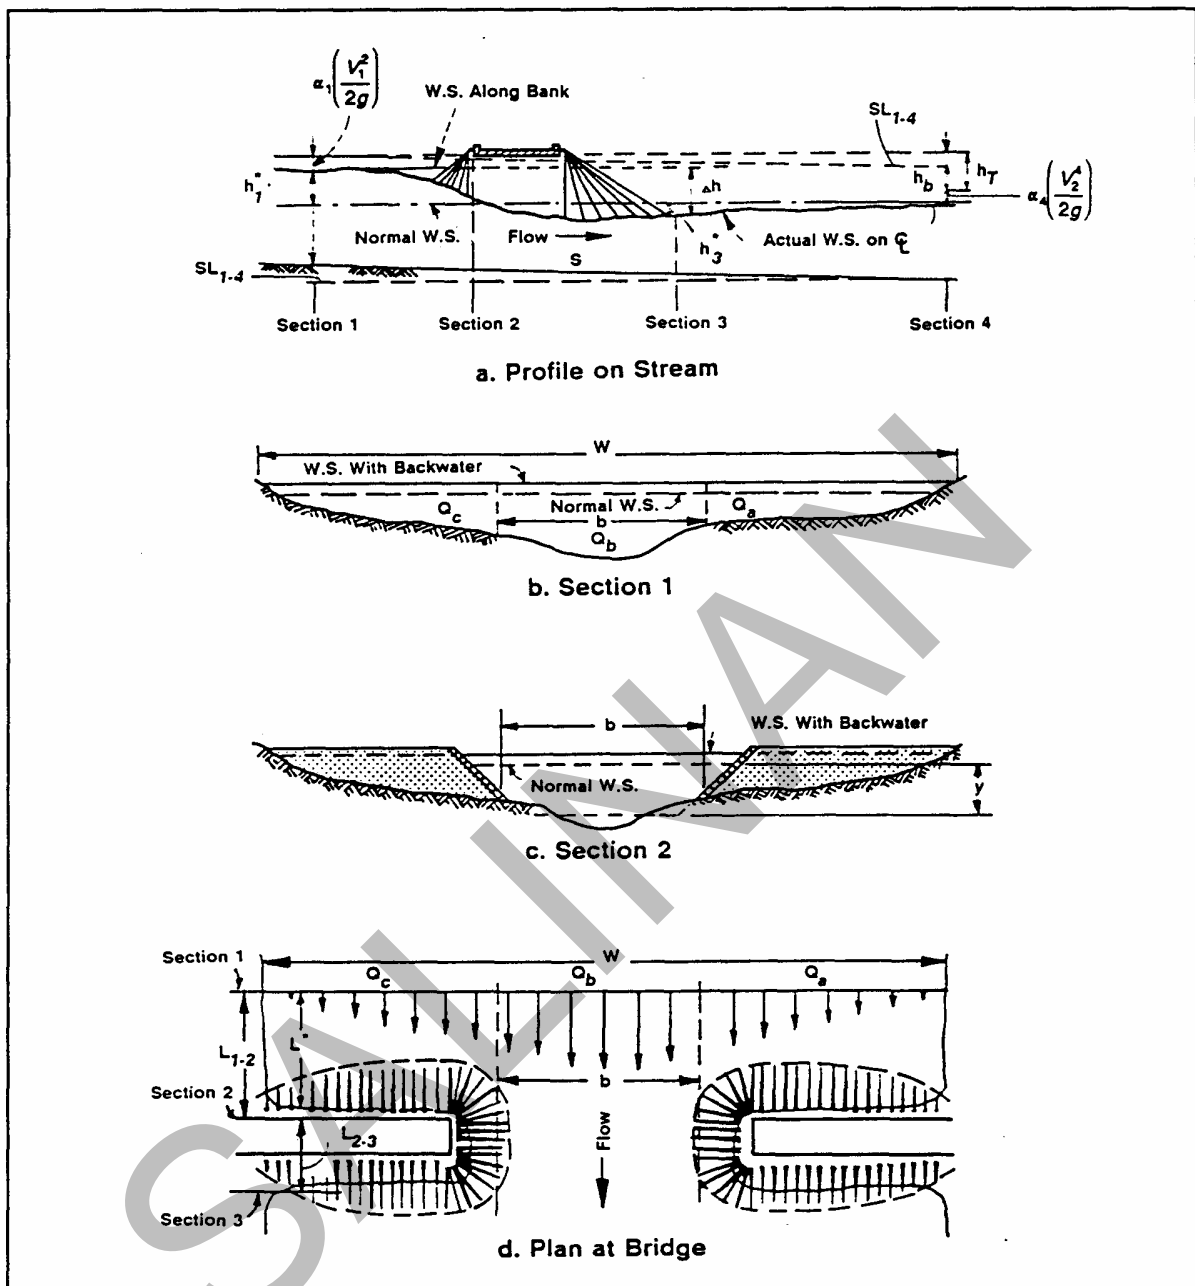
Normal Crossing - Spillthrough Abutments
